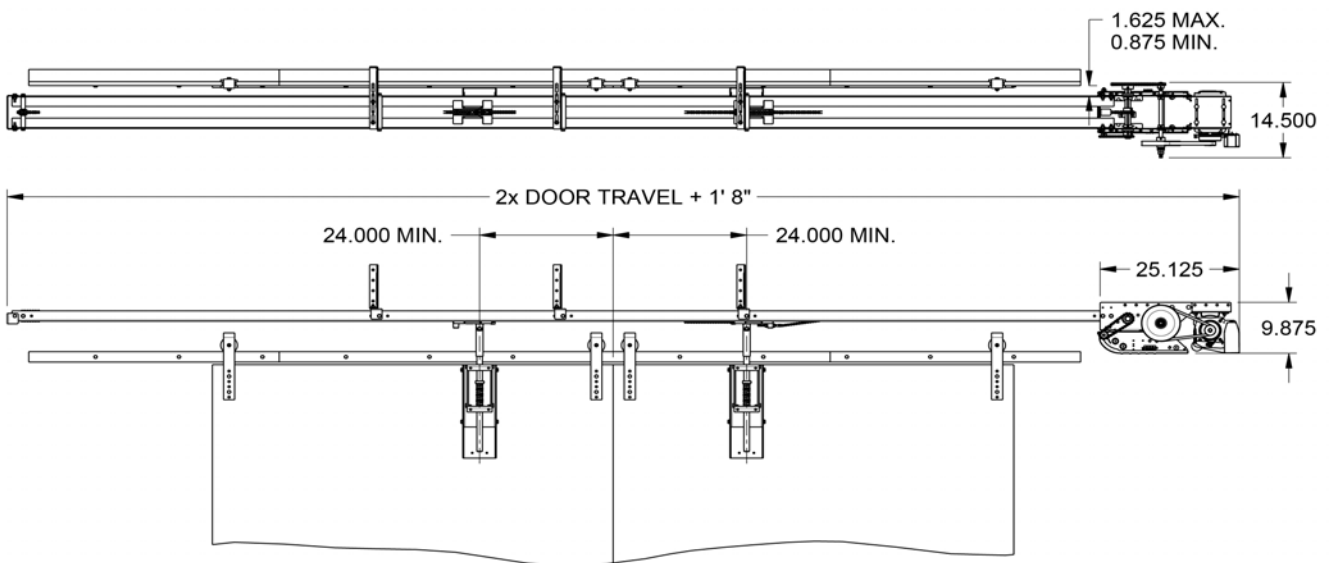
Sliding Bi-Parting Door Operator Typical Installation
